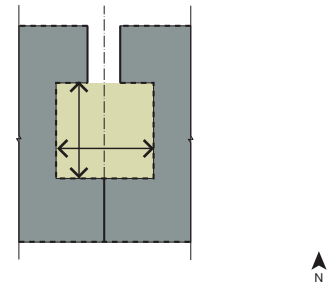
H.4 Where limited setbacks and deep buildings are unavoidable, 'step in' the plan layout to create internal courtyards for improved privacy and daylight access
